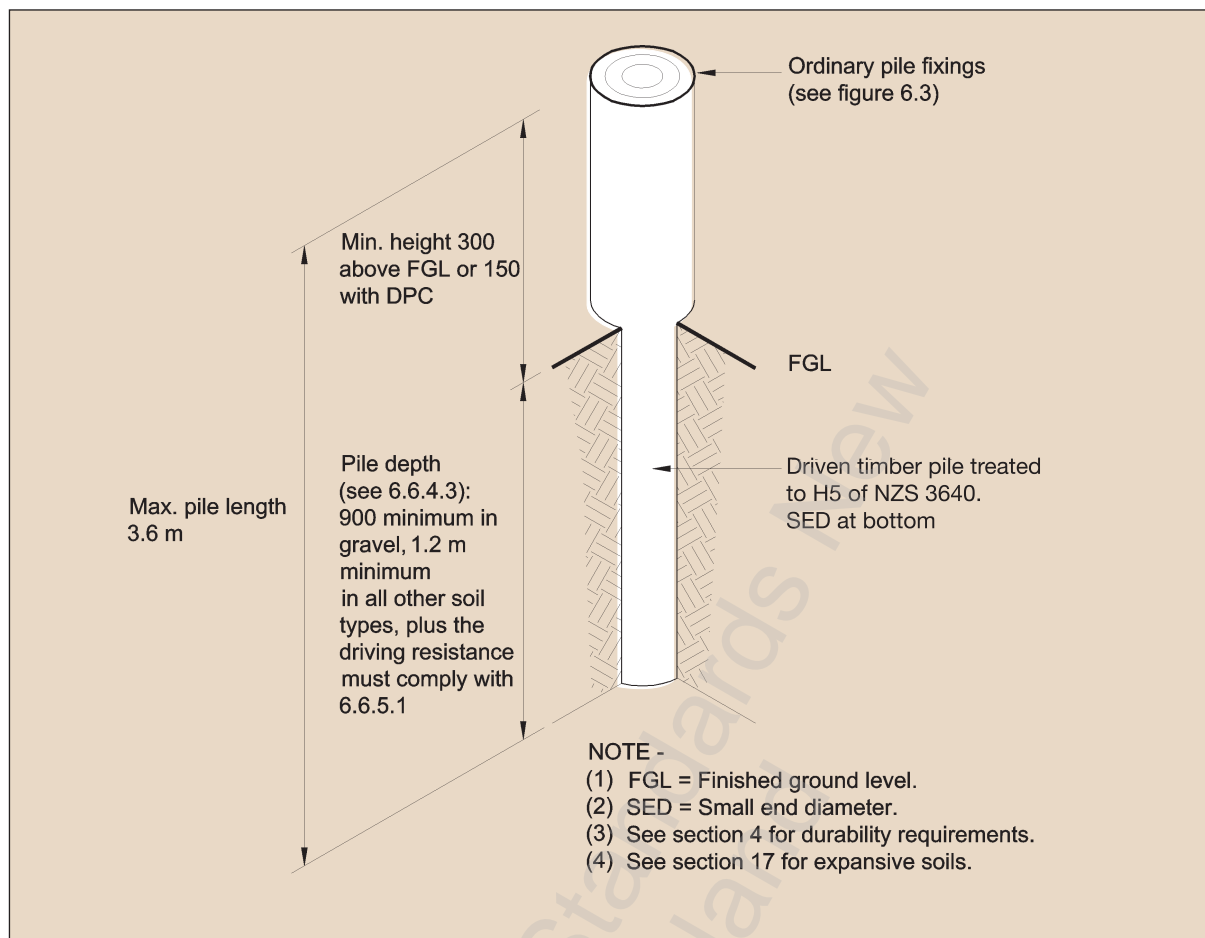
Driven timber piles (see 6.6.4.3)
